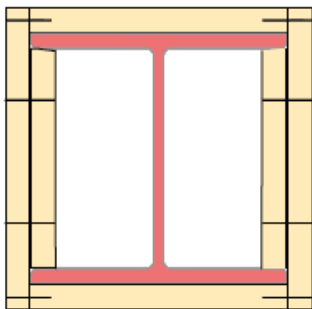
Plan view of Universal Steel Column showing completion of inner layer Knauf Fireboard with Fireboard Fillets
